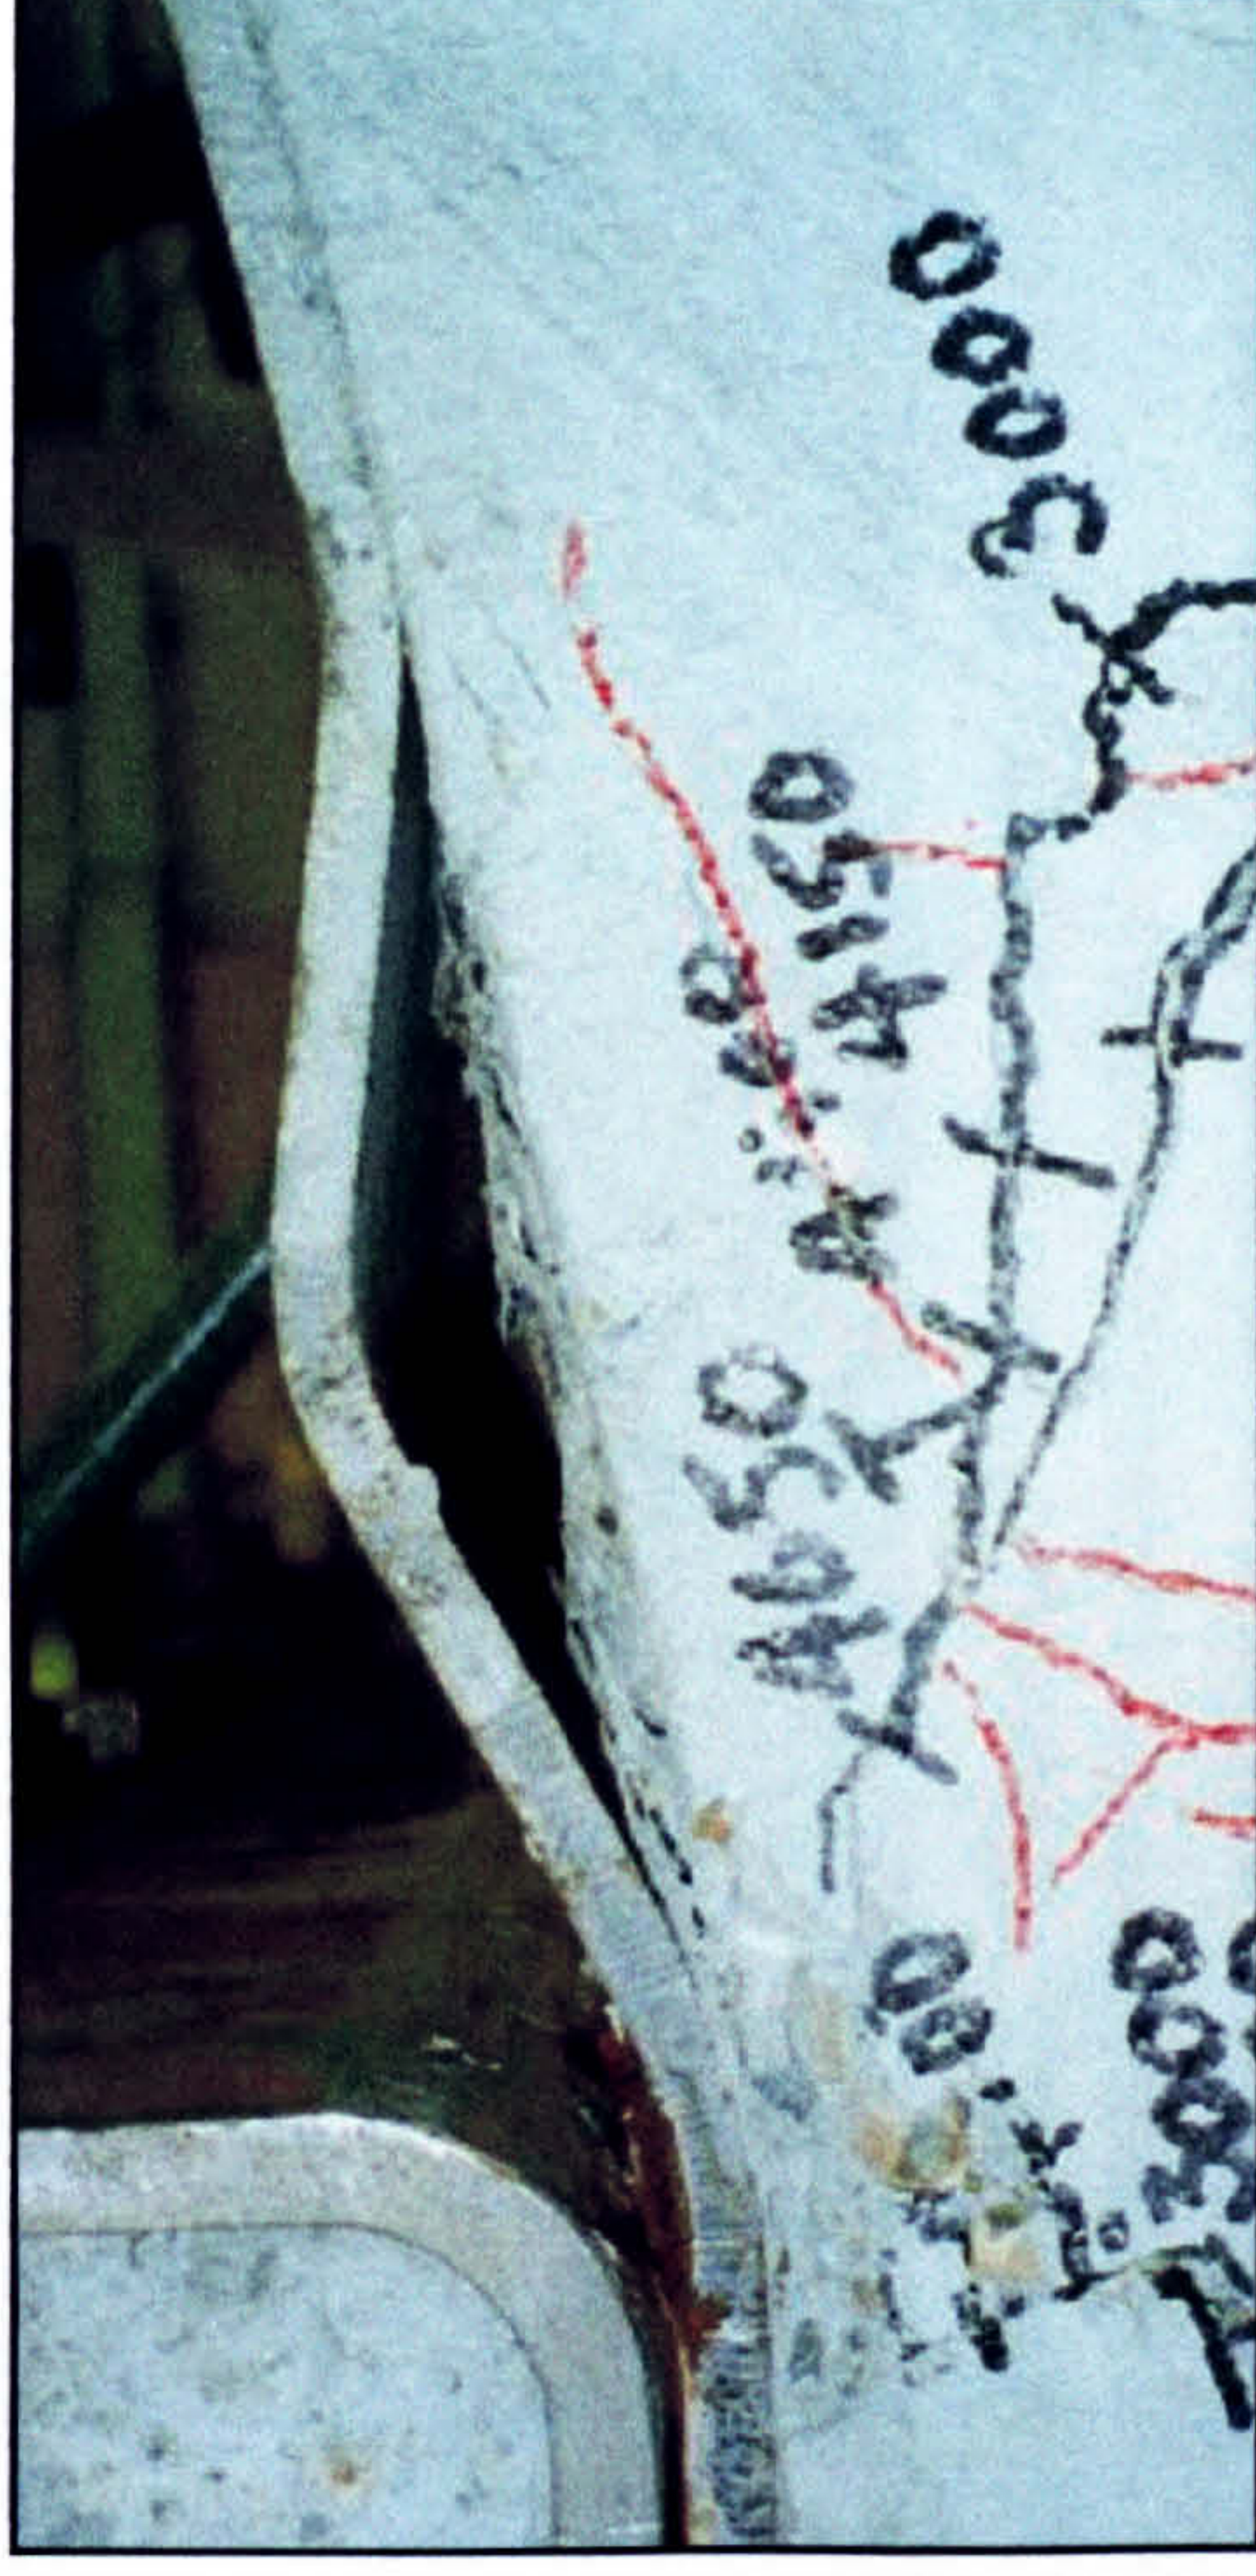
Close-up of failed area showing concrete cracks originating from connector locations. Crack progression is marked in black for load (psi) and red for deflection (mm).
